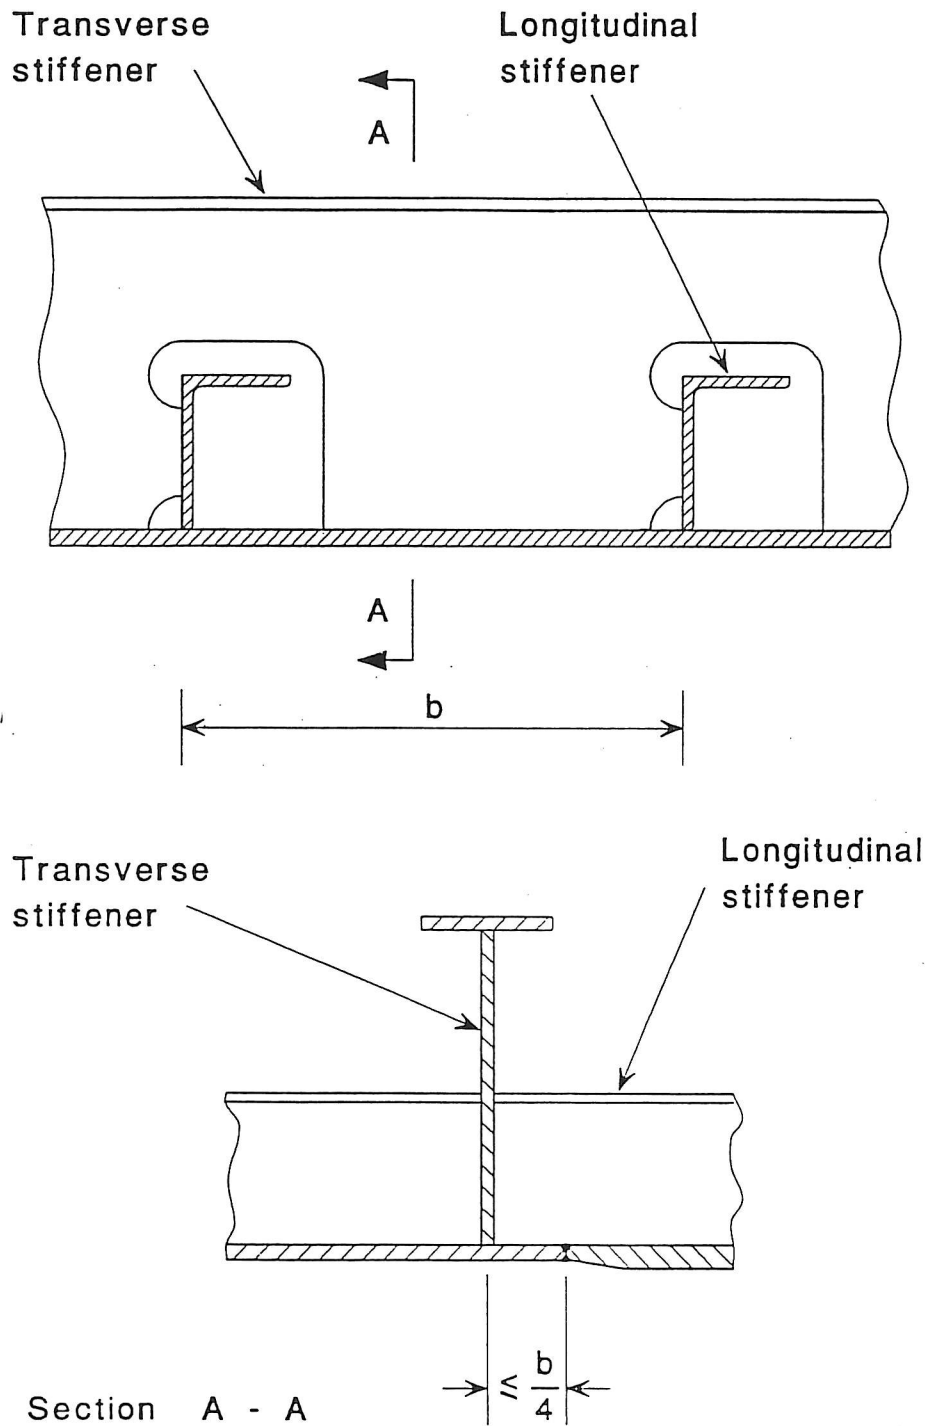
Transverse stiffener welded to thinner plate adjacent to transverse butt weld in the plate
